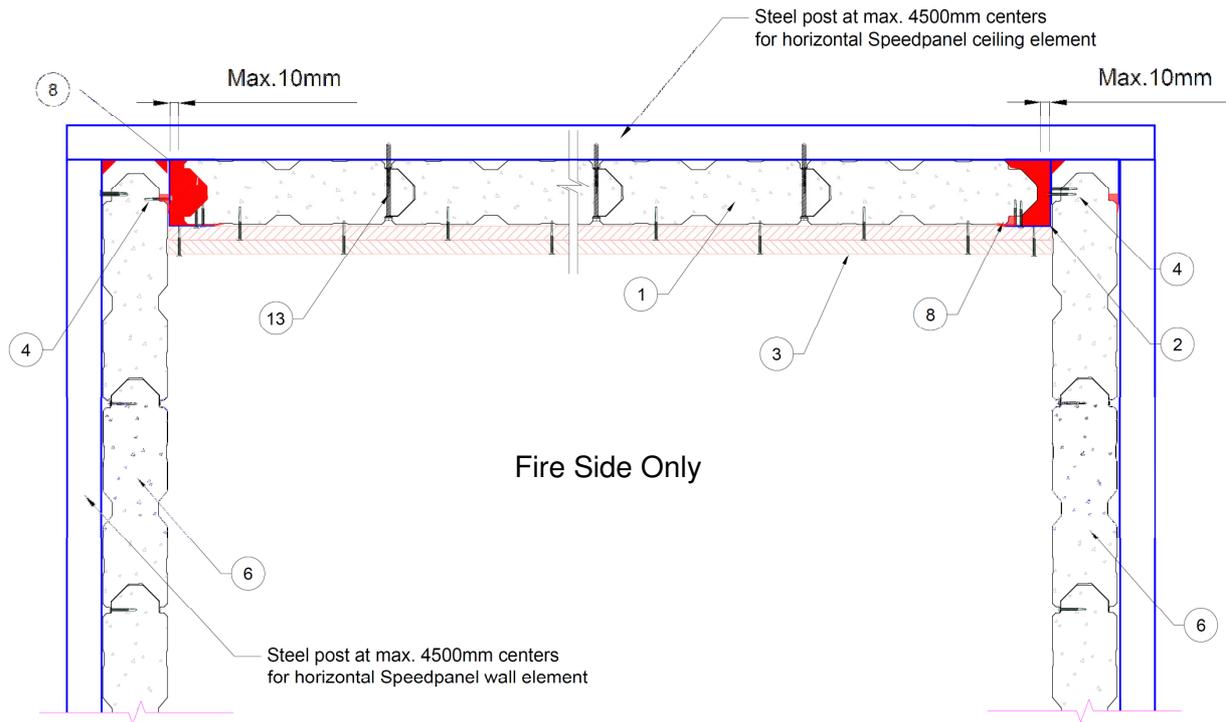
Speedpanel ceiling protected with plasterboard linings (Cross Section View)
